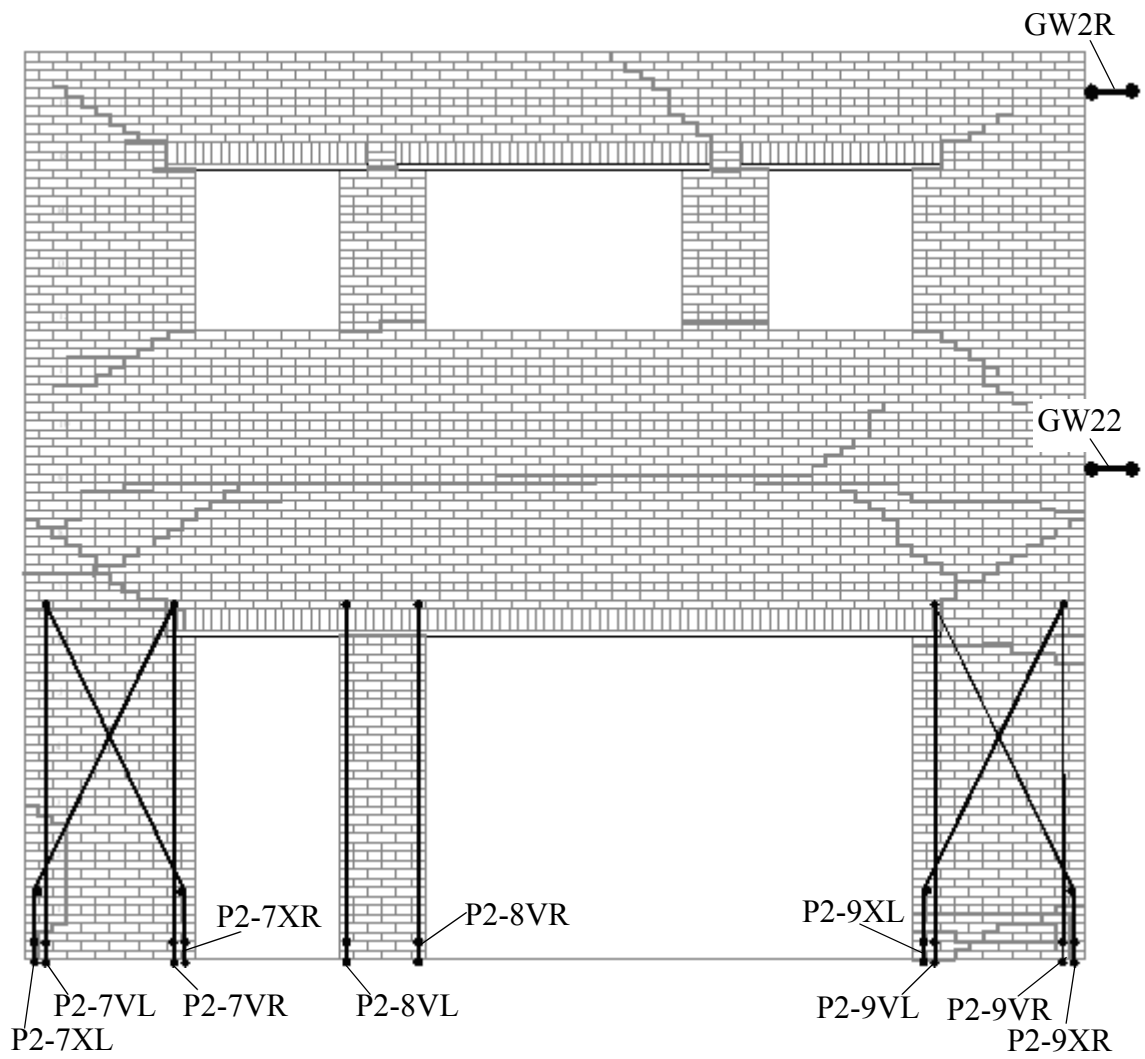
Elevation view of Wall 2 illustrating the location of LVDTs
